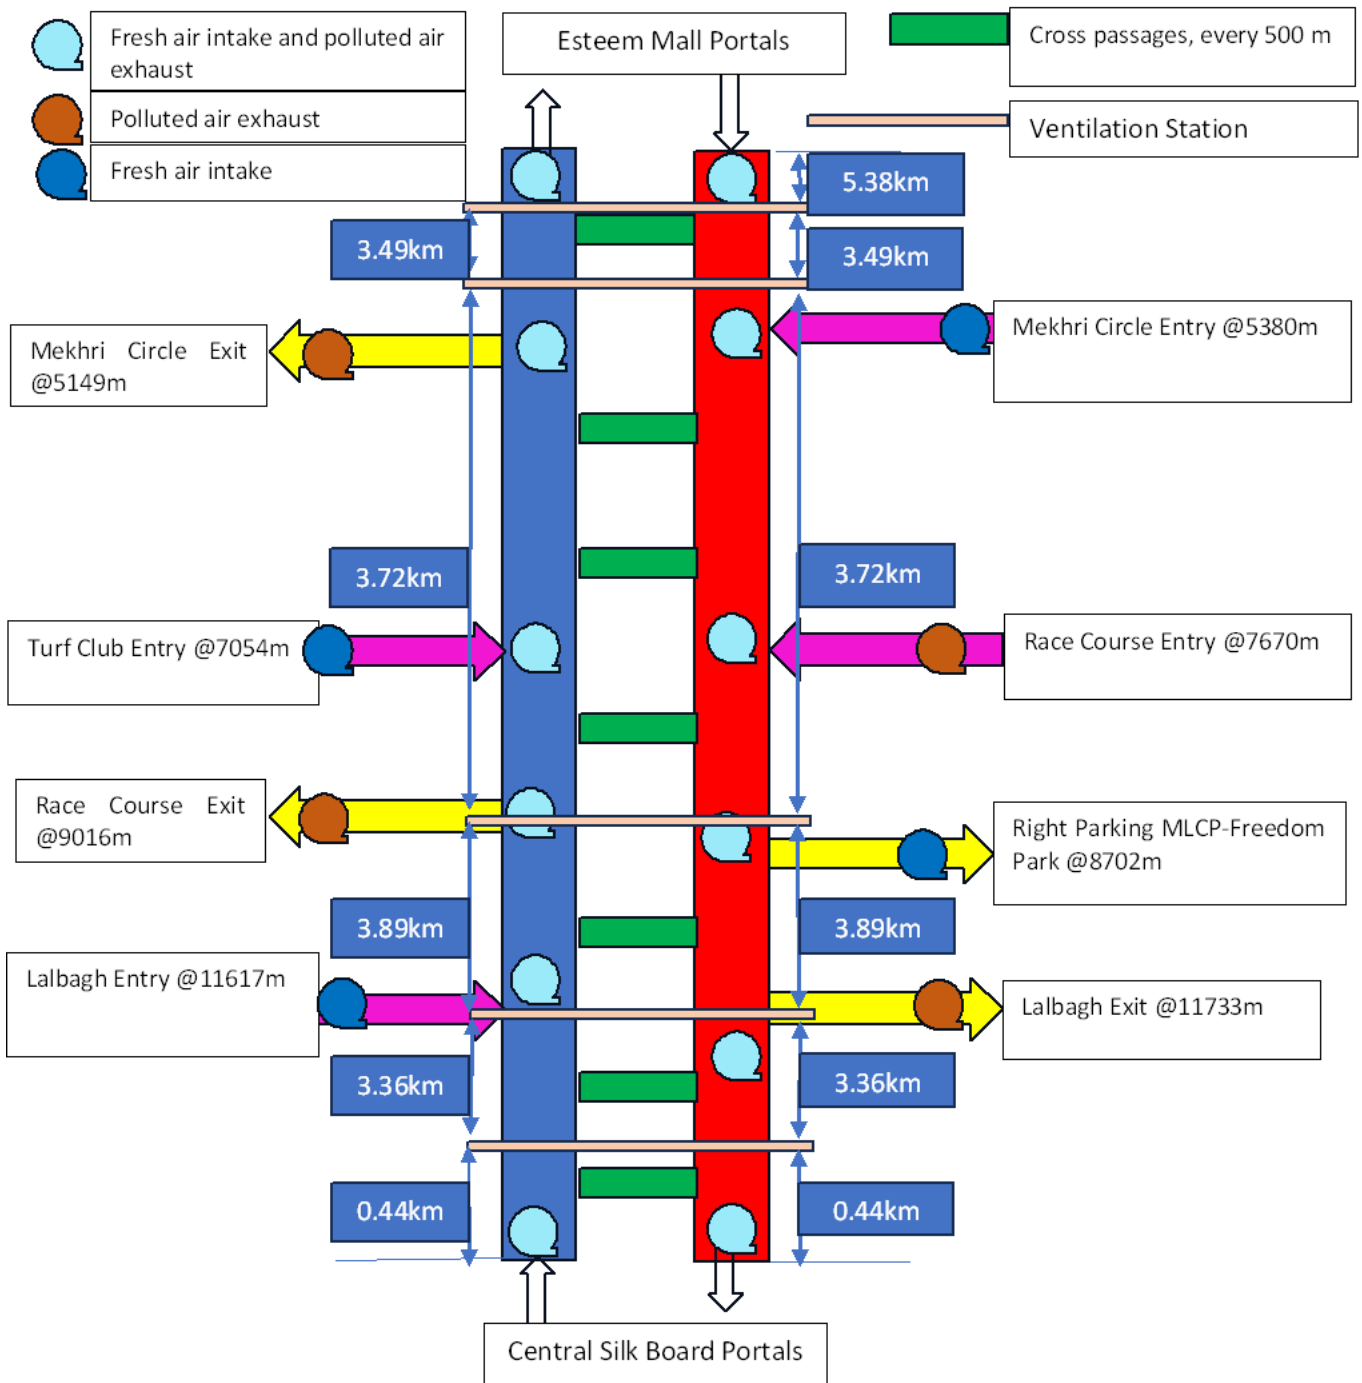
General layout of the proposed tunnel with Ventilation Stations (not to the scale)
